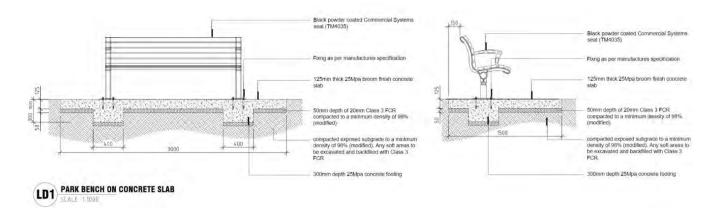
Typical proposed park bench seating on concrete slab. (Source: Design Table Landscape Architecture and Urban)
